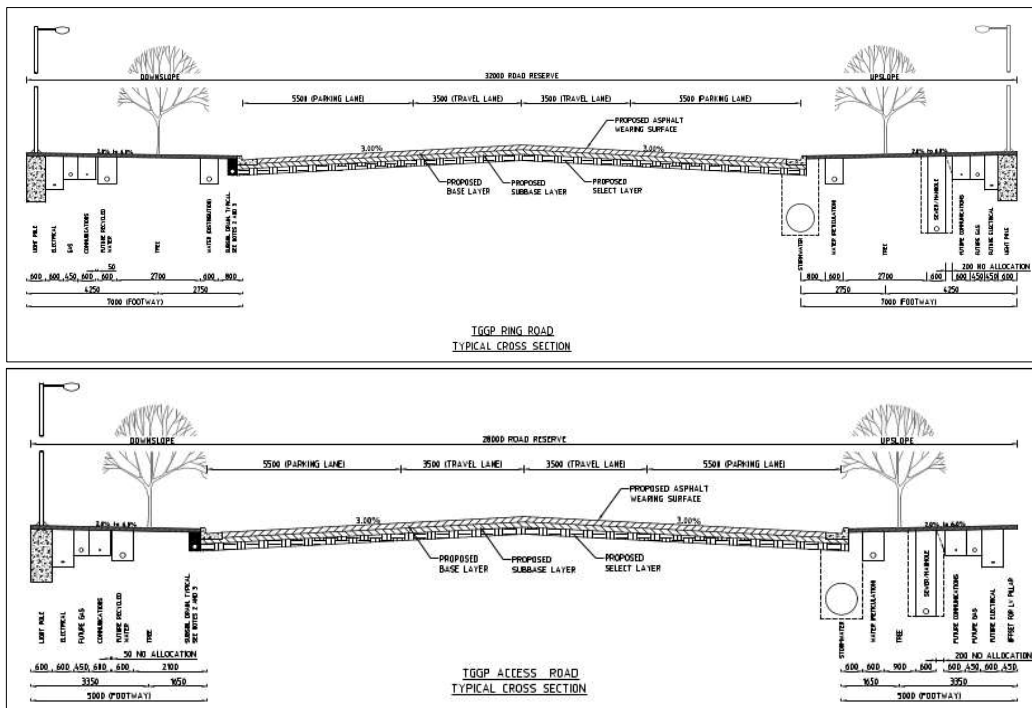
A – Typical Road Cross Sections – TGGP Ring Road (Bandaar Drive)
